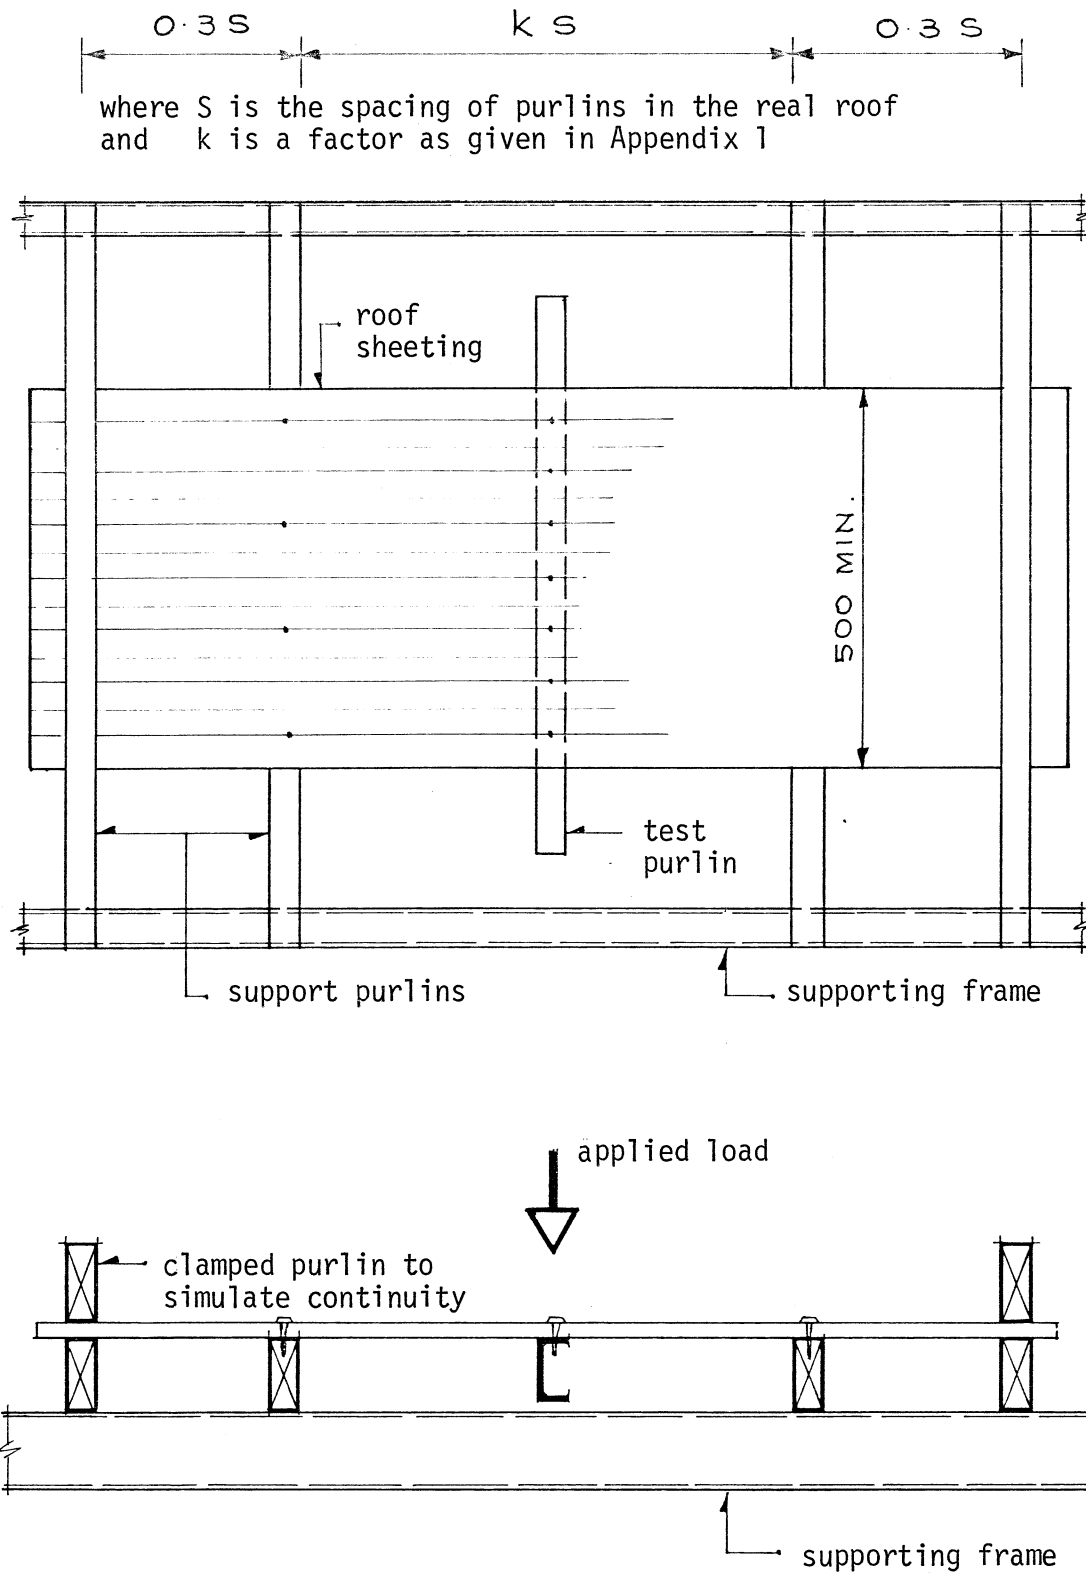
Apparatus Used when Modelling Roof Spans
